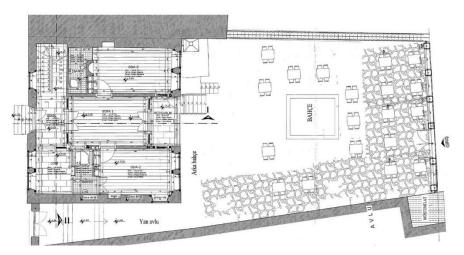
Hich Hotel A Block ground floor plan diagram (Karatay Municipality archive)
